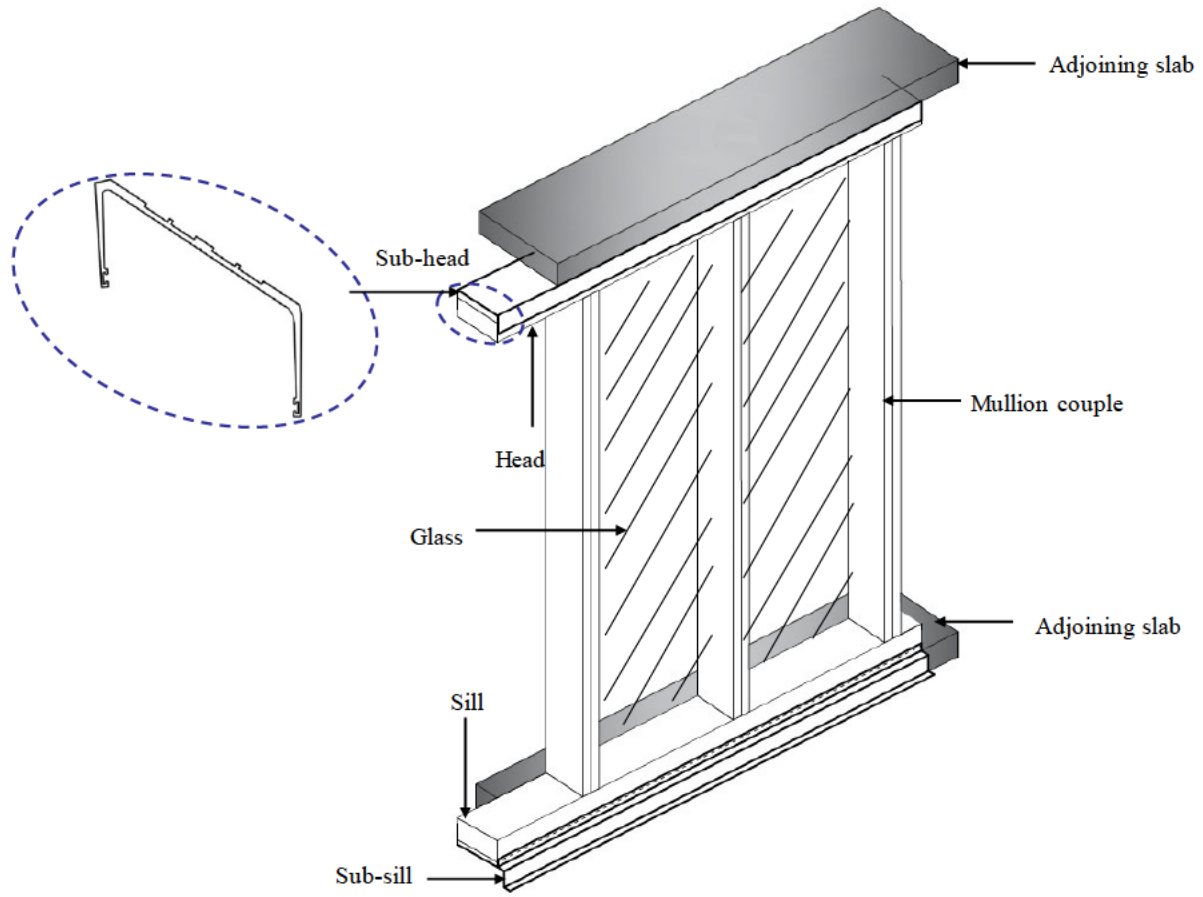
Details of window wall frame, sub-head and sub-sill.
